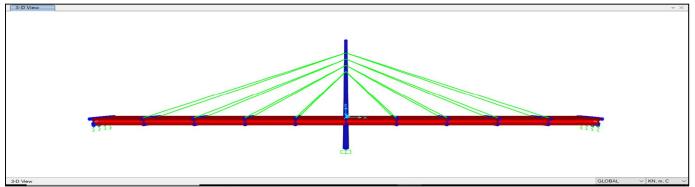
3D model of Cable-Stayed Bridge for 100m span.
